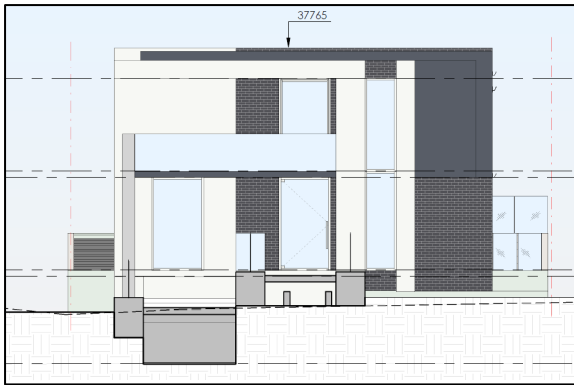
Approved North Elevation (note: Condition 6 imposed to reduce the void around the stairs)
